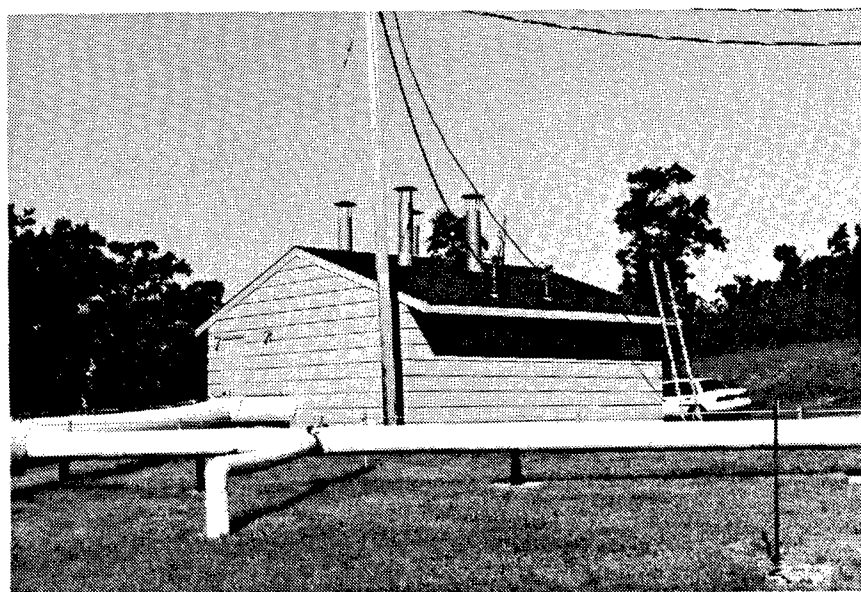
Building 570: Blower House/Environmental Treatment Site.
